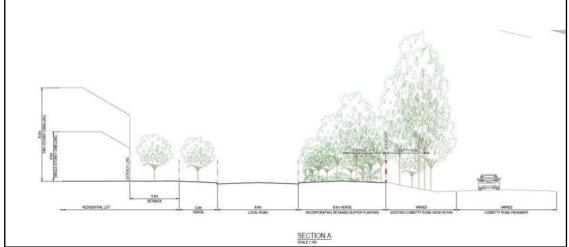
Cross section Cobbitty Road, perimeter road (existing DCP)
